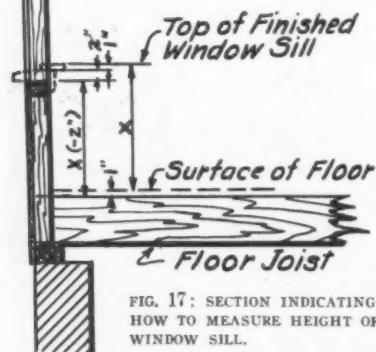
SECTION INDICATING HOW TO MEASURE HEIGHT OF WINDOW SILL.
